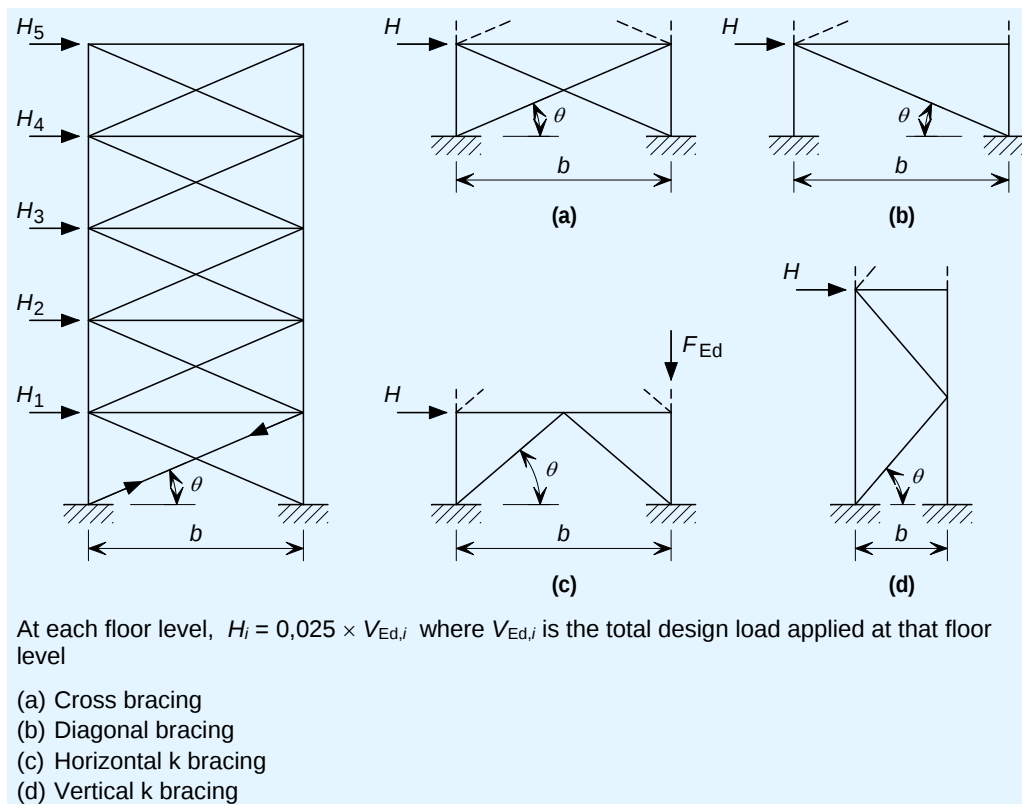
Typical arrangements of vertical bracing (as Figure 2.3)
